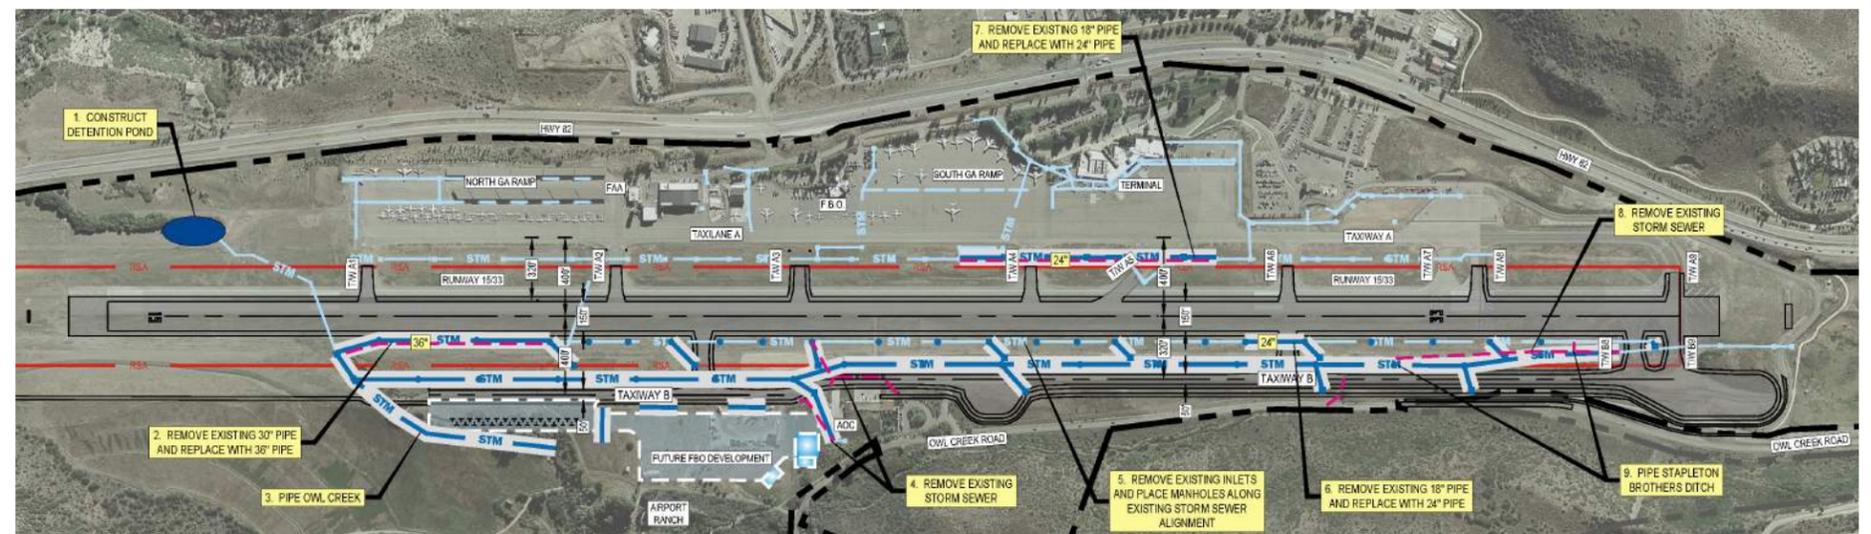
Storm Drainage Layout (Alternative 12a, Sheet 24 of 30)
